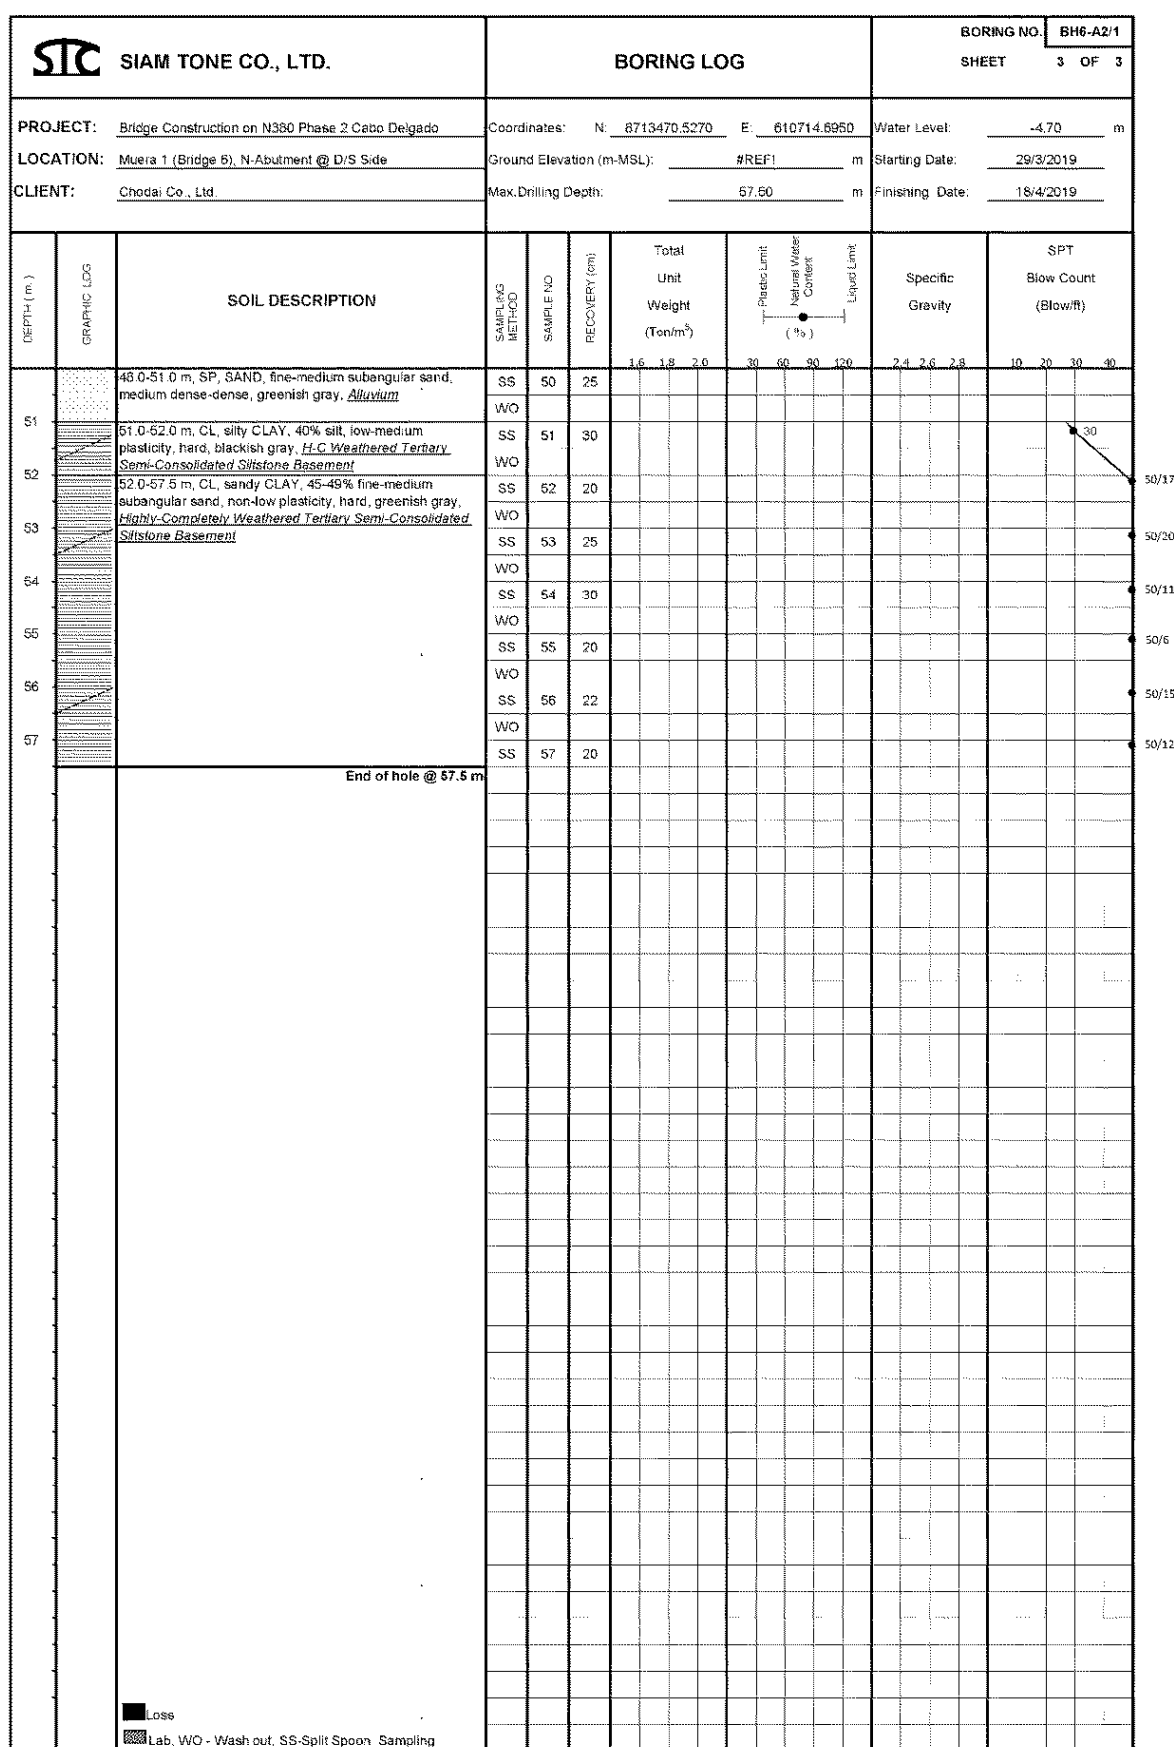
BH6-A2/1 at N-Abutment D/S Side of Muera I Bridge (B6)
